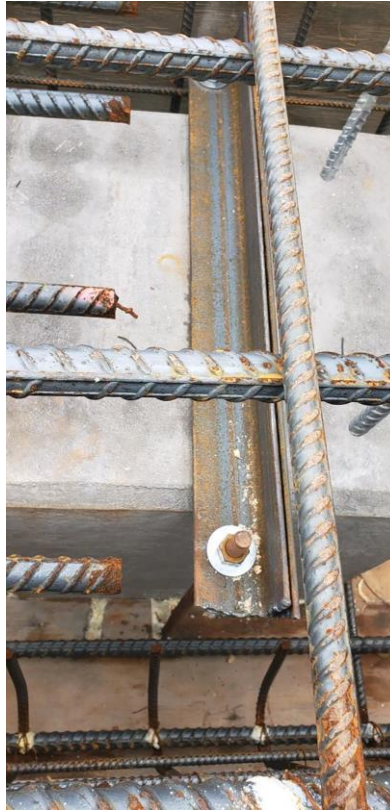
Photo. Example of a modern reinforcing bar. (Source FHWA).
